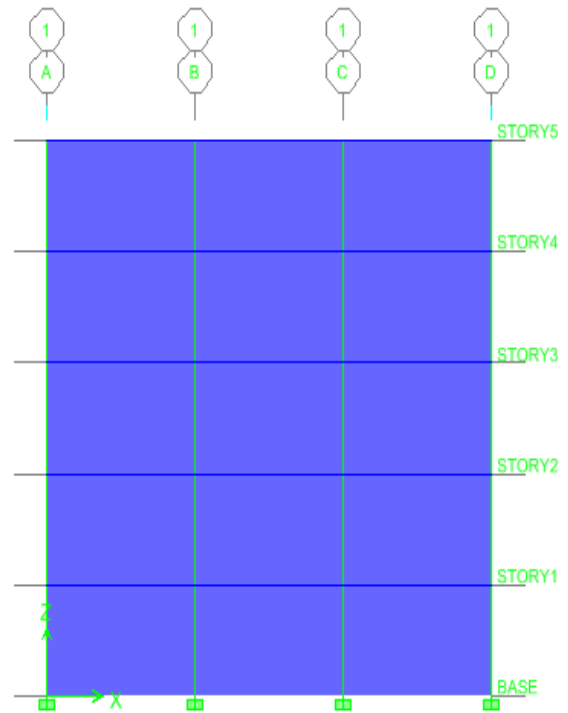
Model Elevation of G+5 Storeyed Building with Walls
